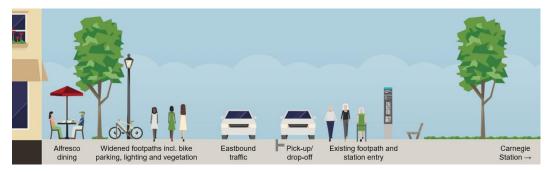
Indicative Morton Avenue shared zone cross section (made with Streetmix)
